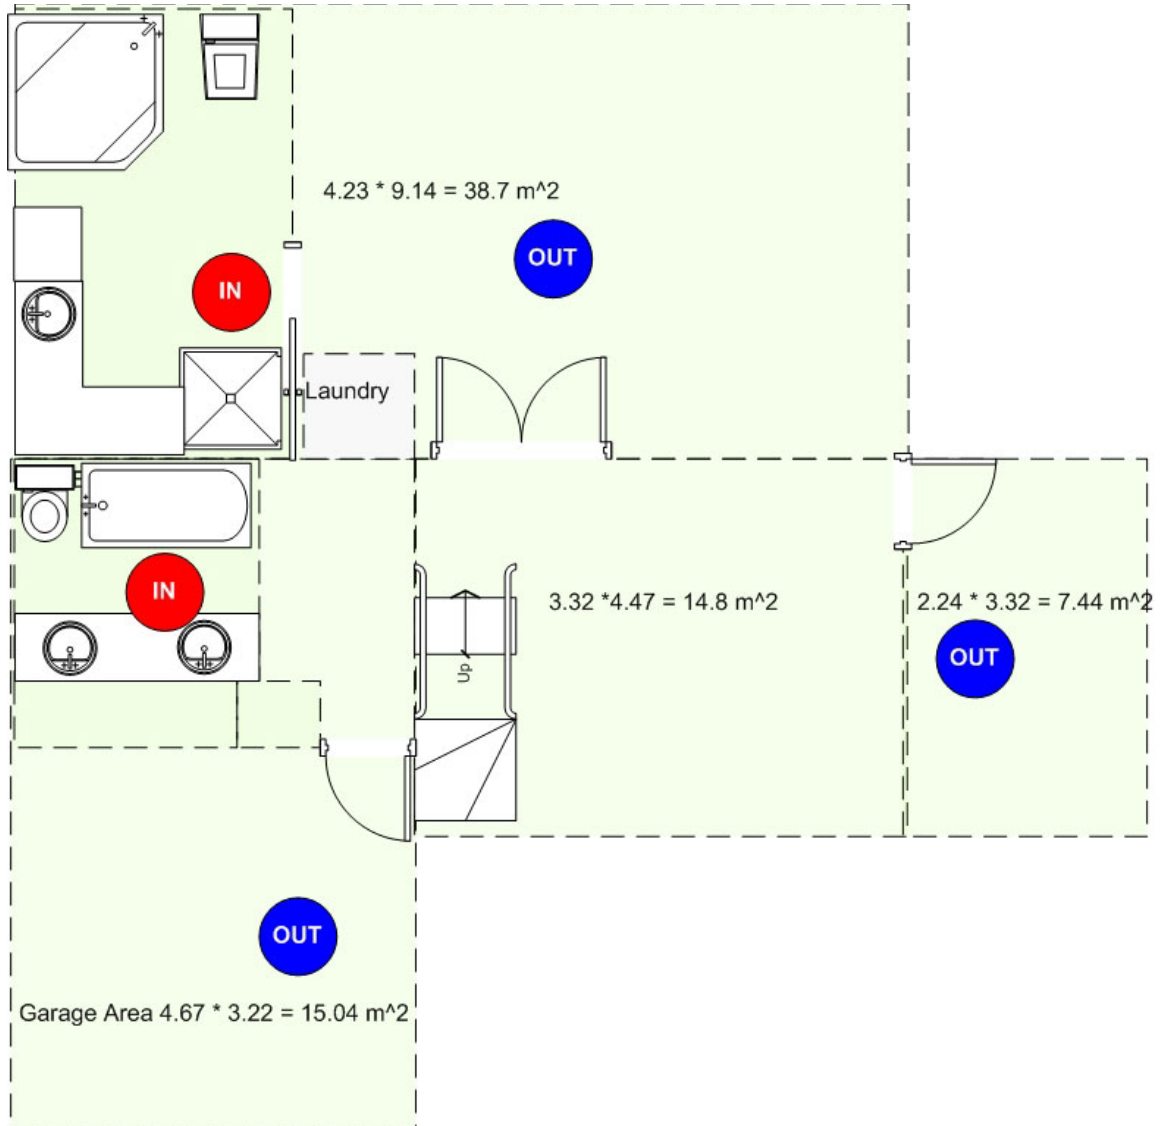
3rd level floor plan, HVAC air intake and exhaust locations
